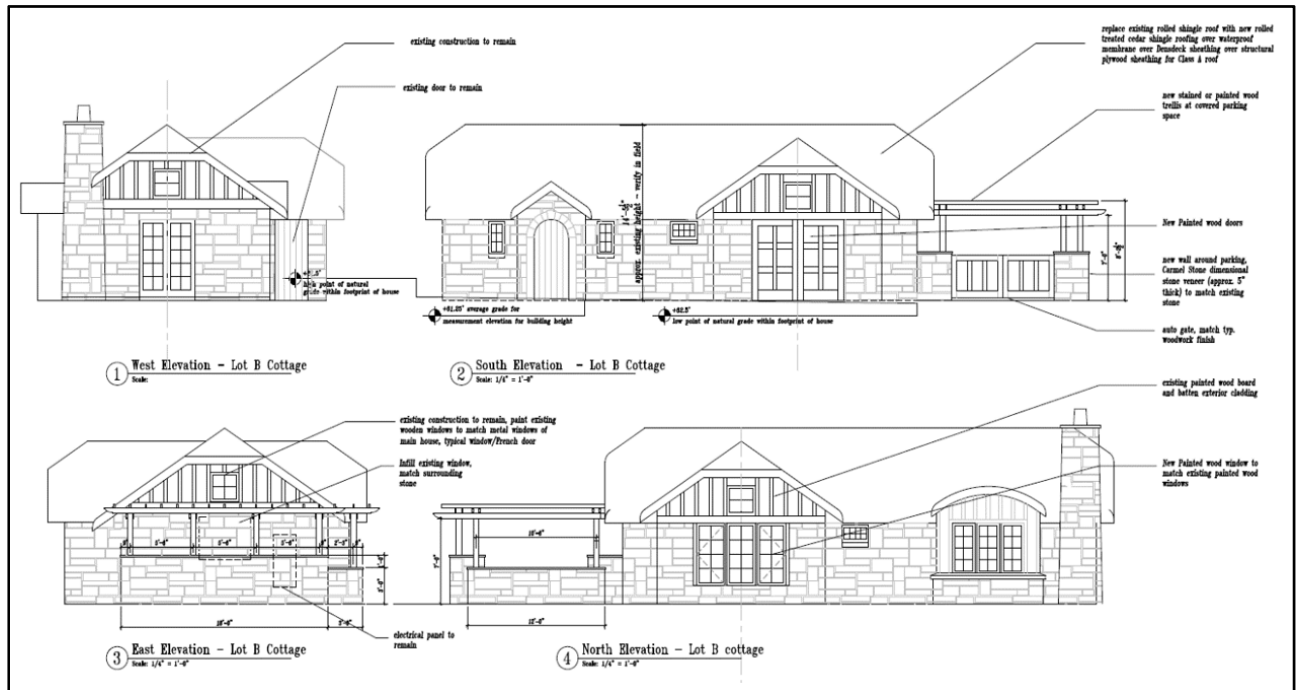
Elevations of Existing Residence on Lot B and New Carport
